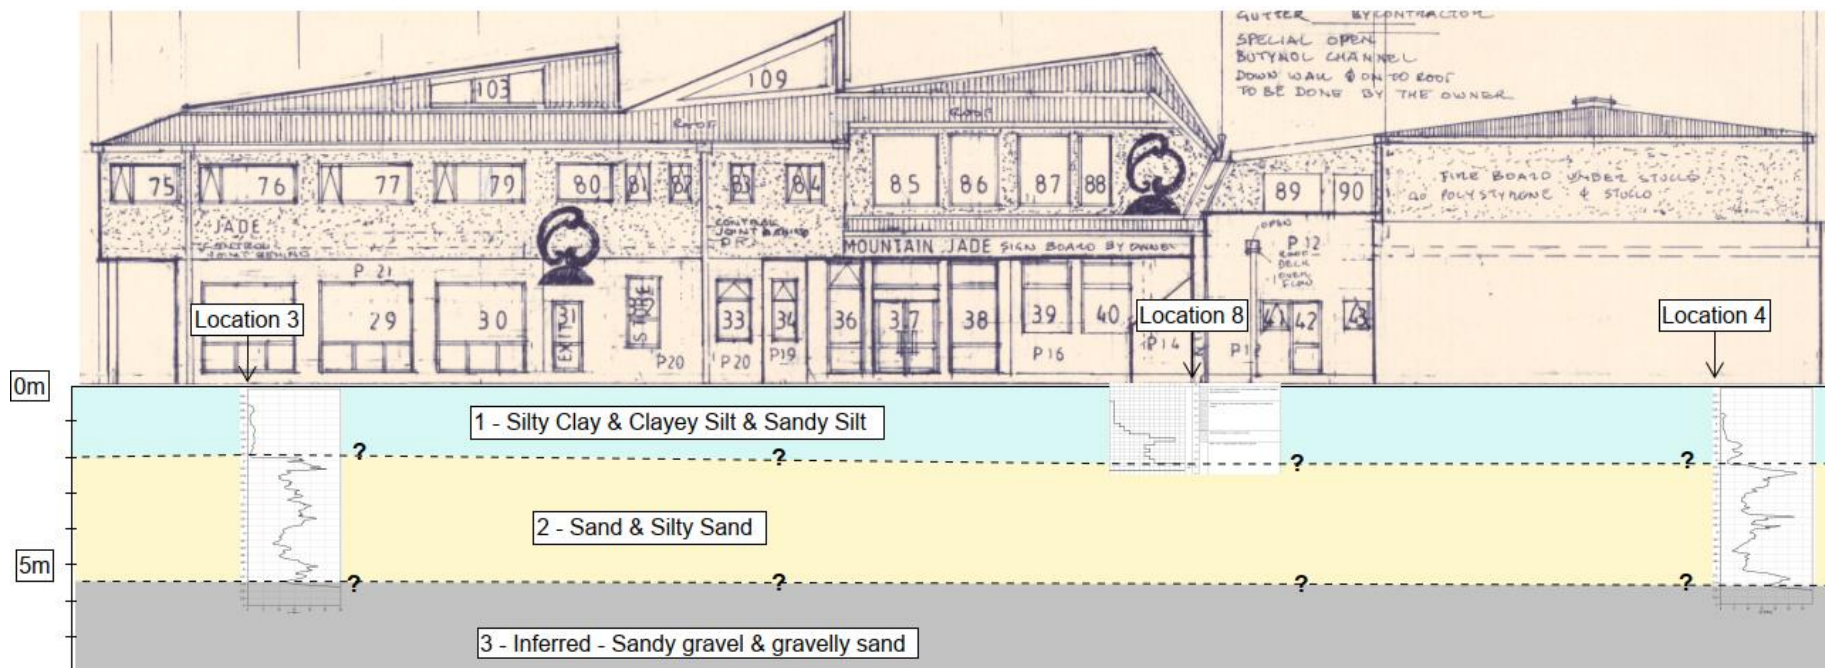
Inferred soil profile beneath 41 Weld Street looking north towards the south elevation.
